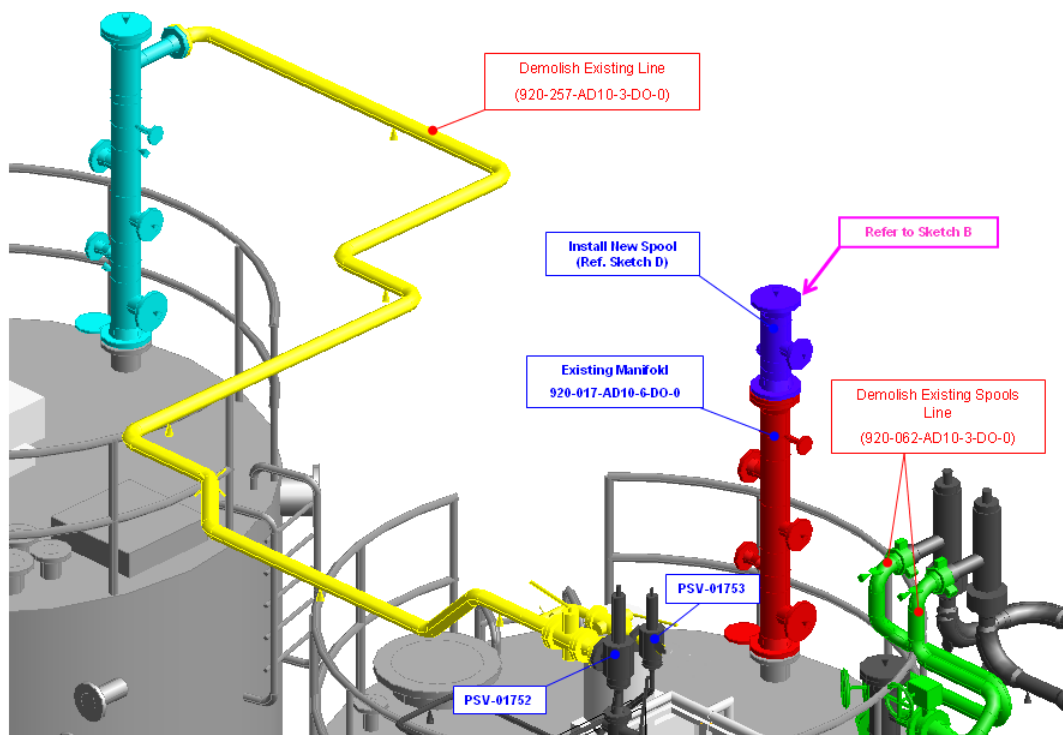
Existing layout (side view) of the Slurry system in Mud Handling system
